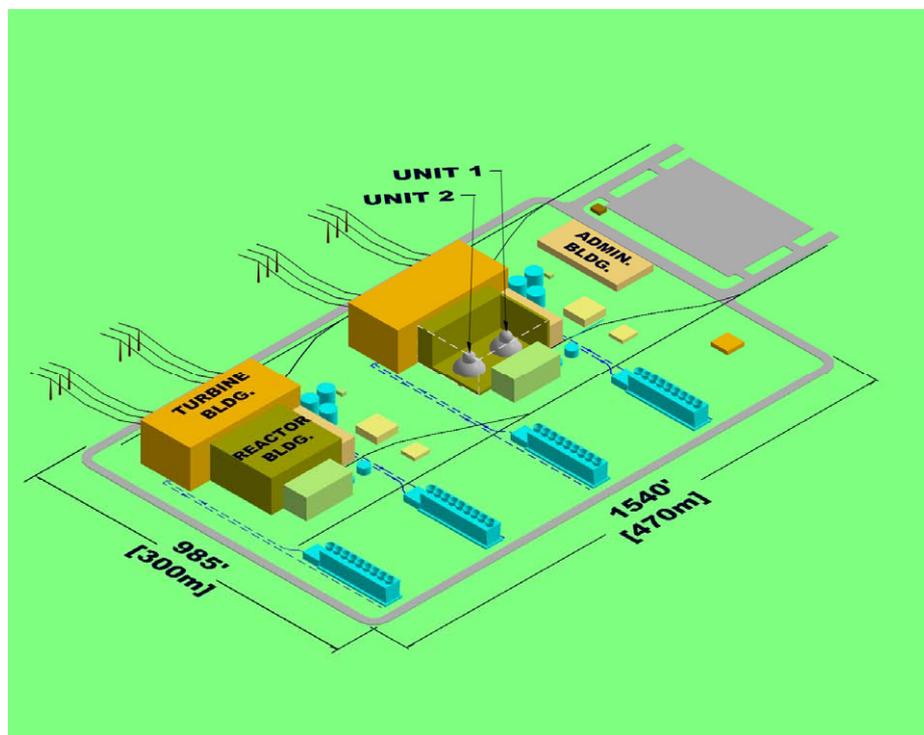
Perspective view of IRIS multiple twin-unit site layout.
